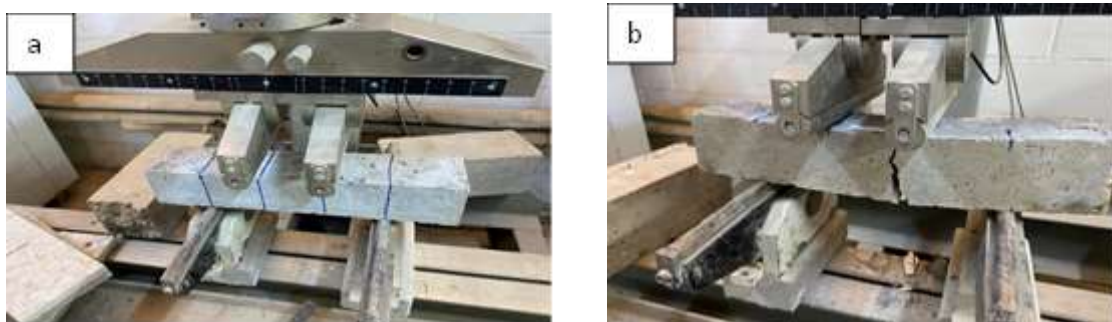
(a) RCCP sample in the test machine, (b) RCCP sample after the test.
